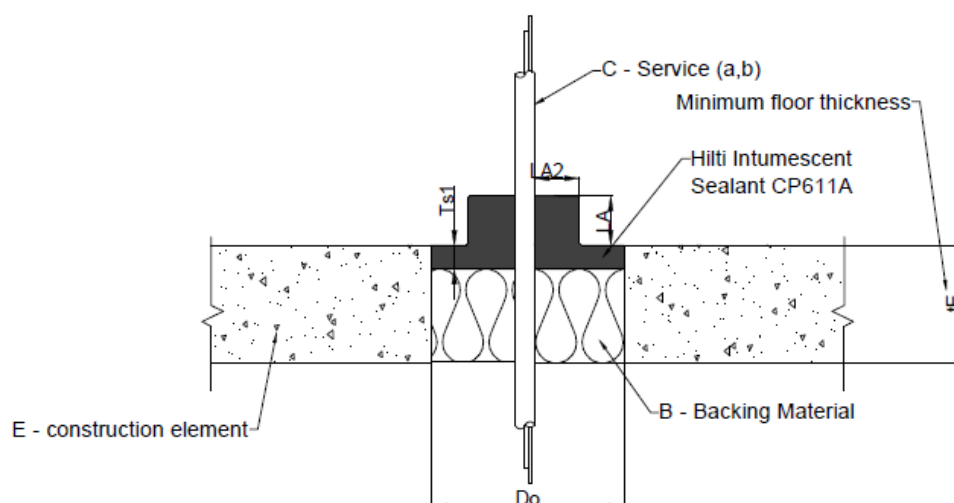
Side View, seal type 19, Steel & uPVC Conduits or tubes $\leq 16\text{mm}$ OD in concrete floor, CP611a + additional protection
